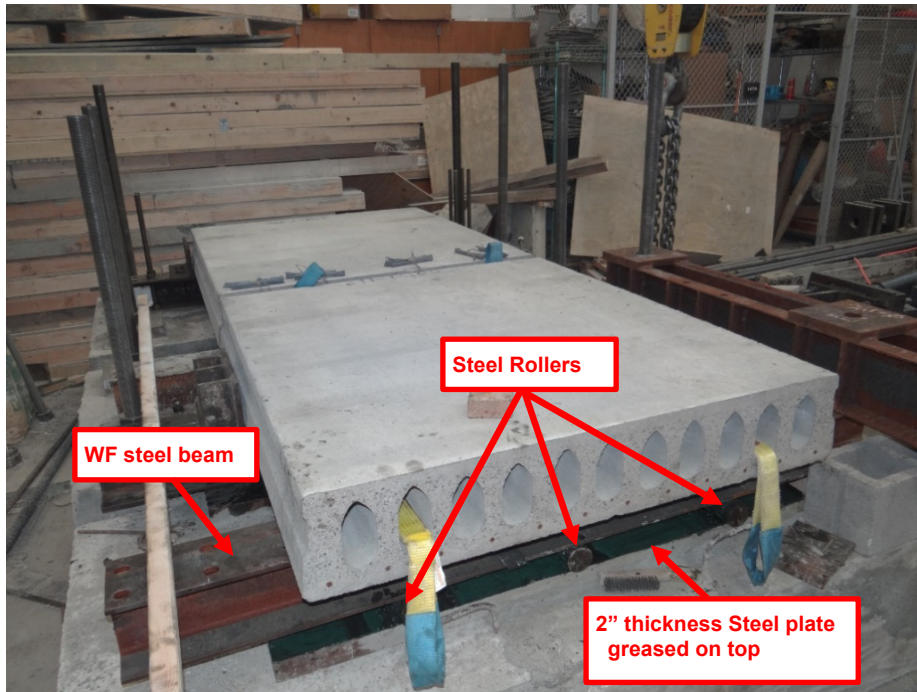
Supports at one end of the concrete hollow core planks (Roller side).
